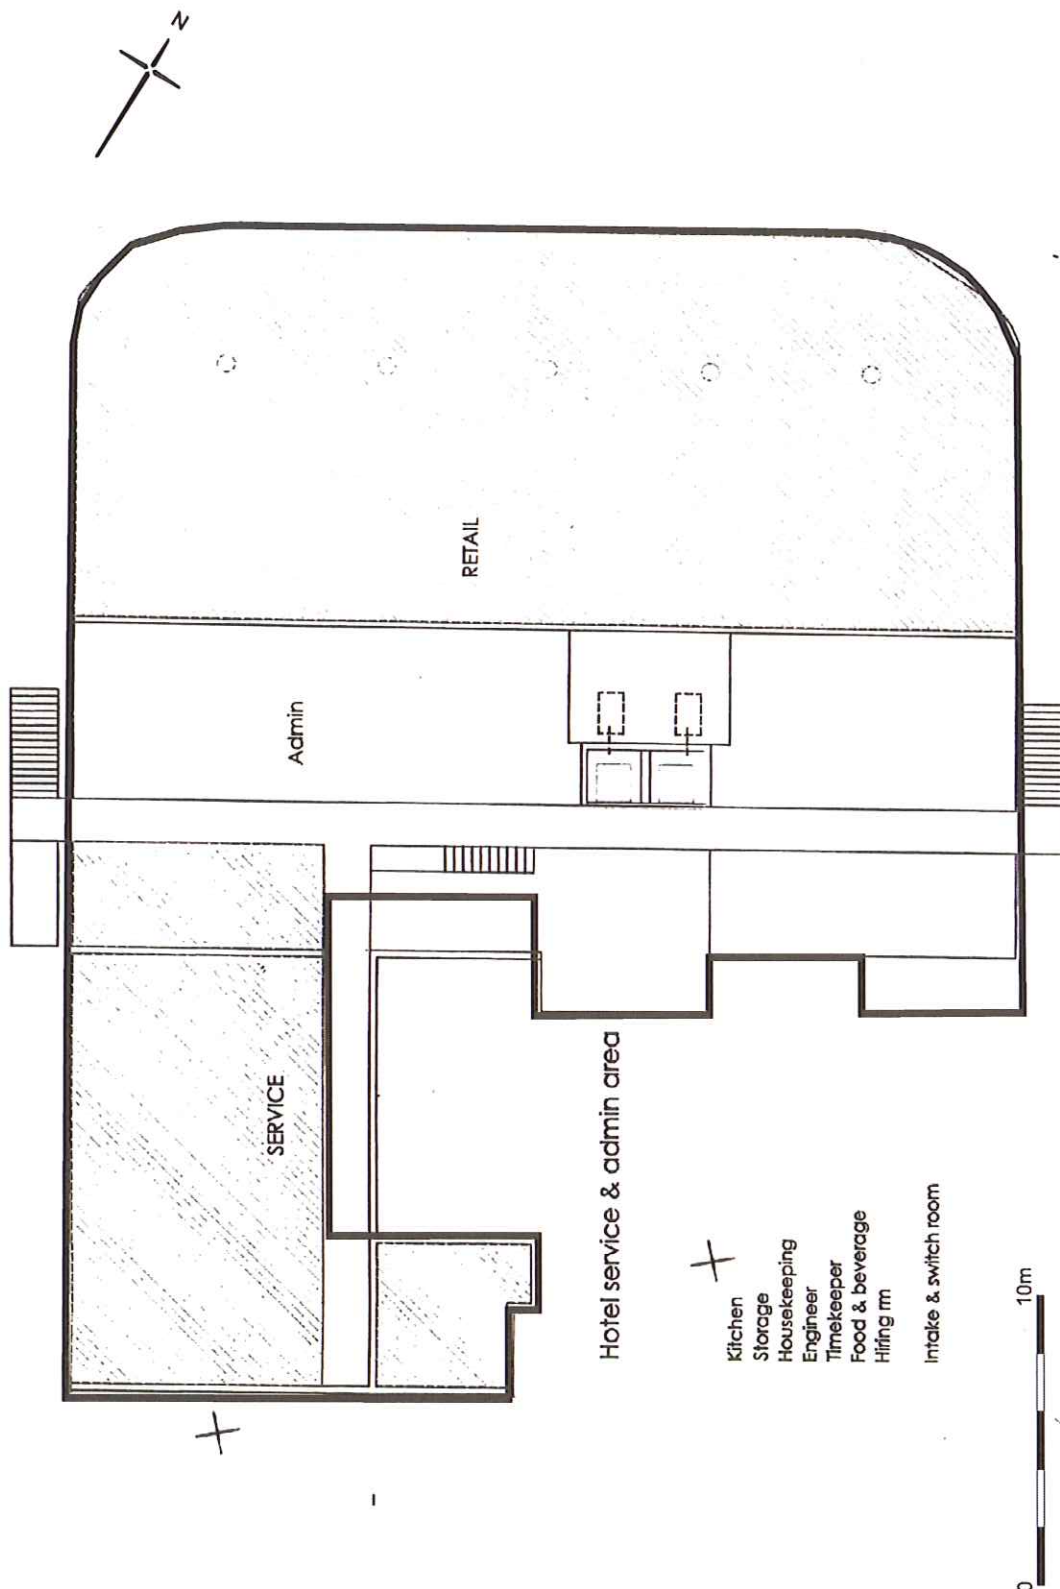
Plan of proposed new basement (Bill Greensmith Architects, received 23.06.06)
